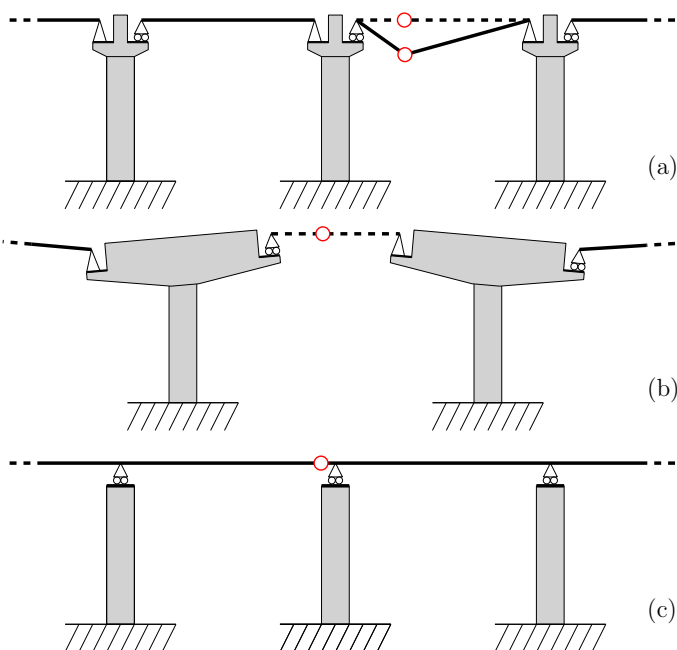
Effects of the formation of a hinge in the deck beams. The damage does not propagate only in the statically indeterminate continuous beam.
